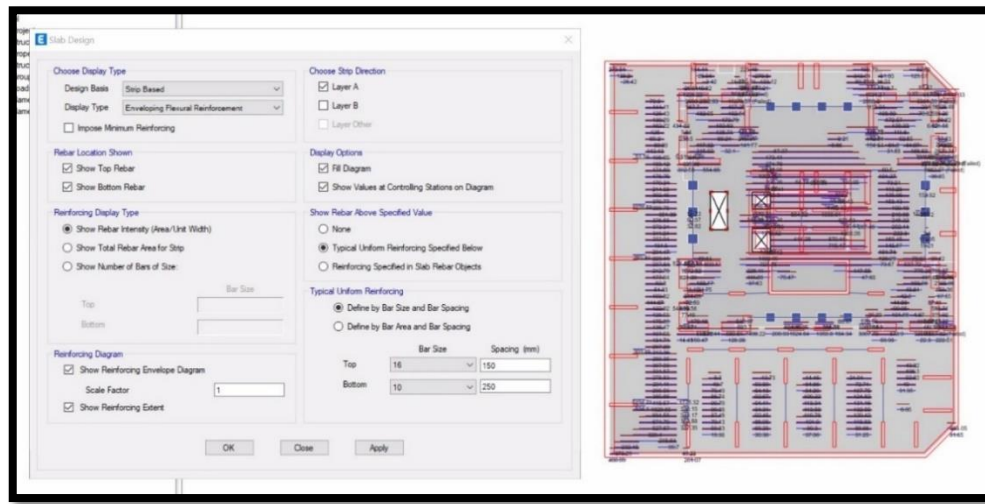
End-Spans X-Direction Reinforcement for 4th Basement Floor
